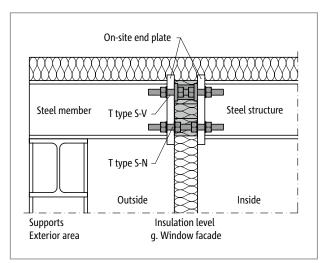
Schöck Isokorb® T type S for thermal separation within the structural system
